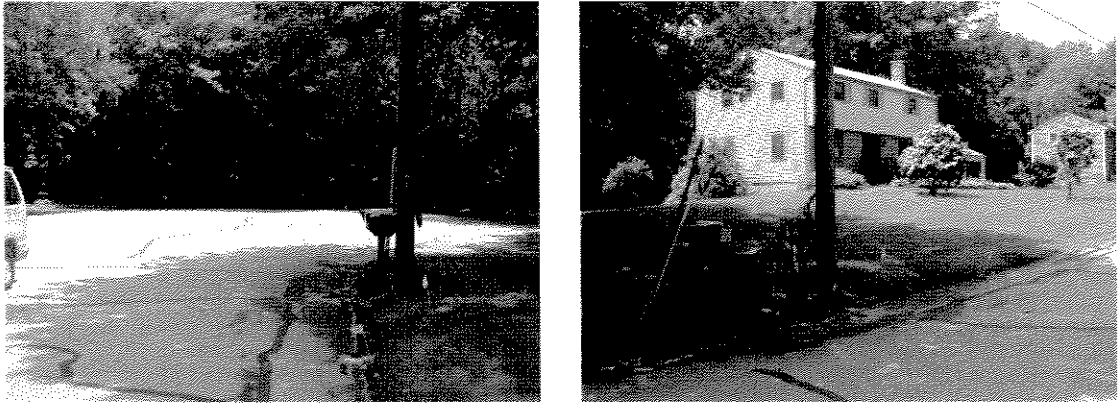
UP #137-4 - Country Club Rd - between house #5 & #9
